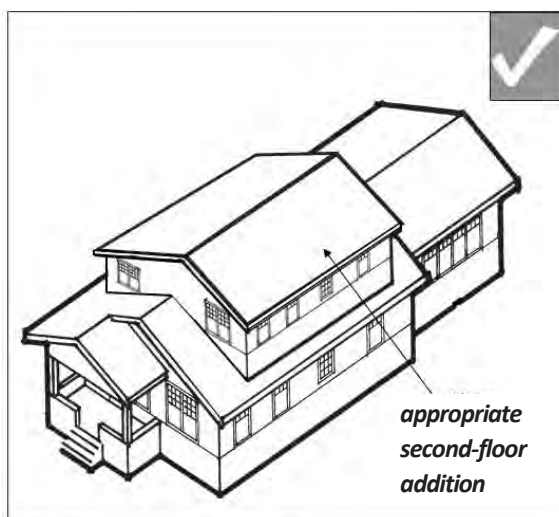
When adding a second-floor addition to an existing single-story bungalow, it should be in scale and character with the primary structure.
